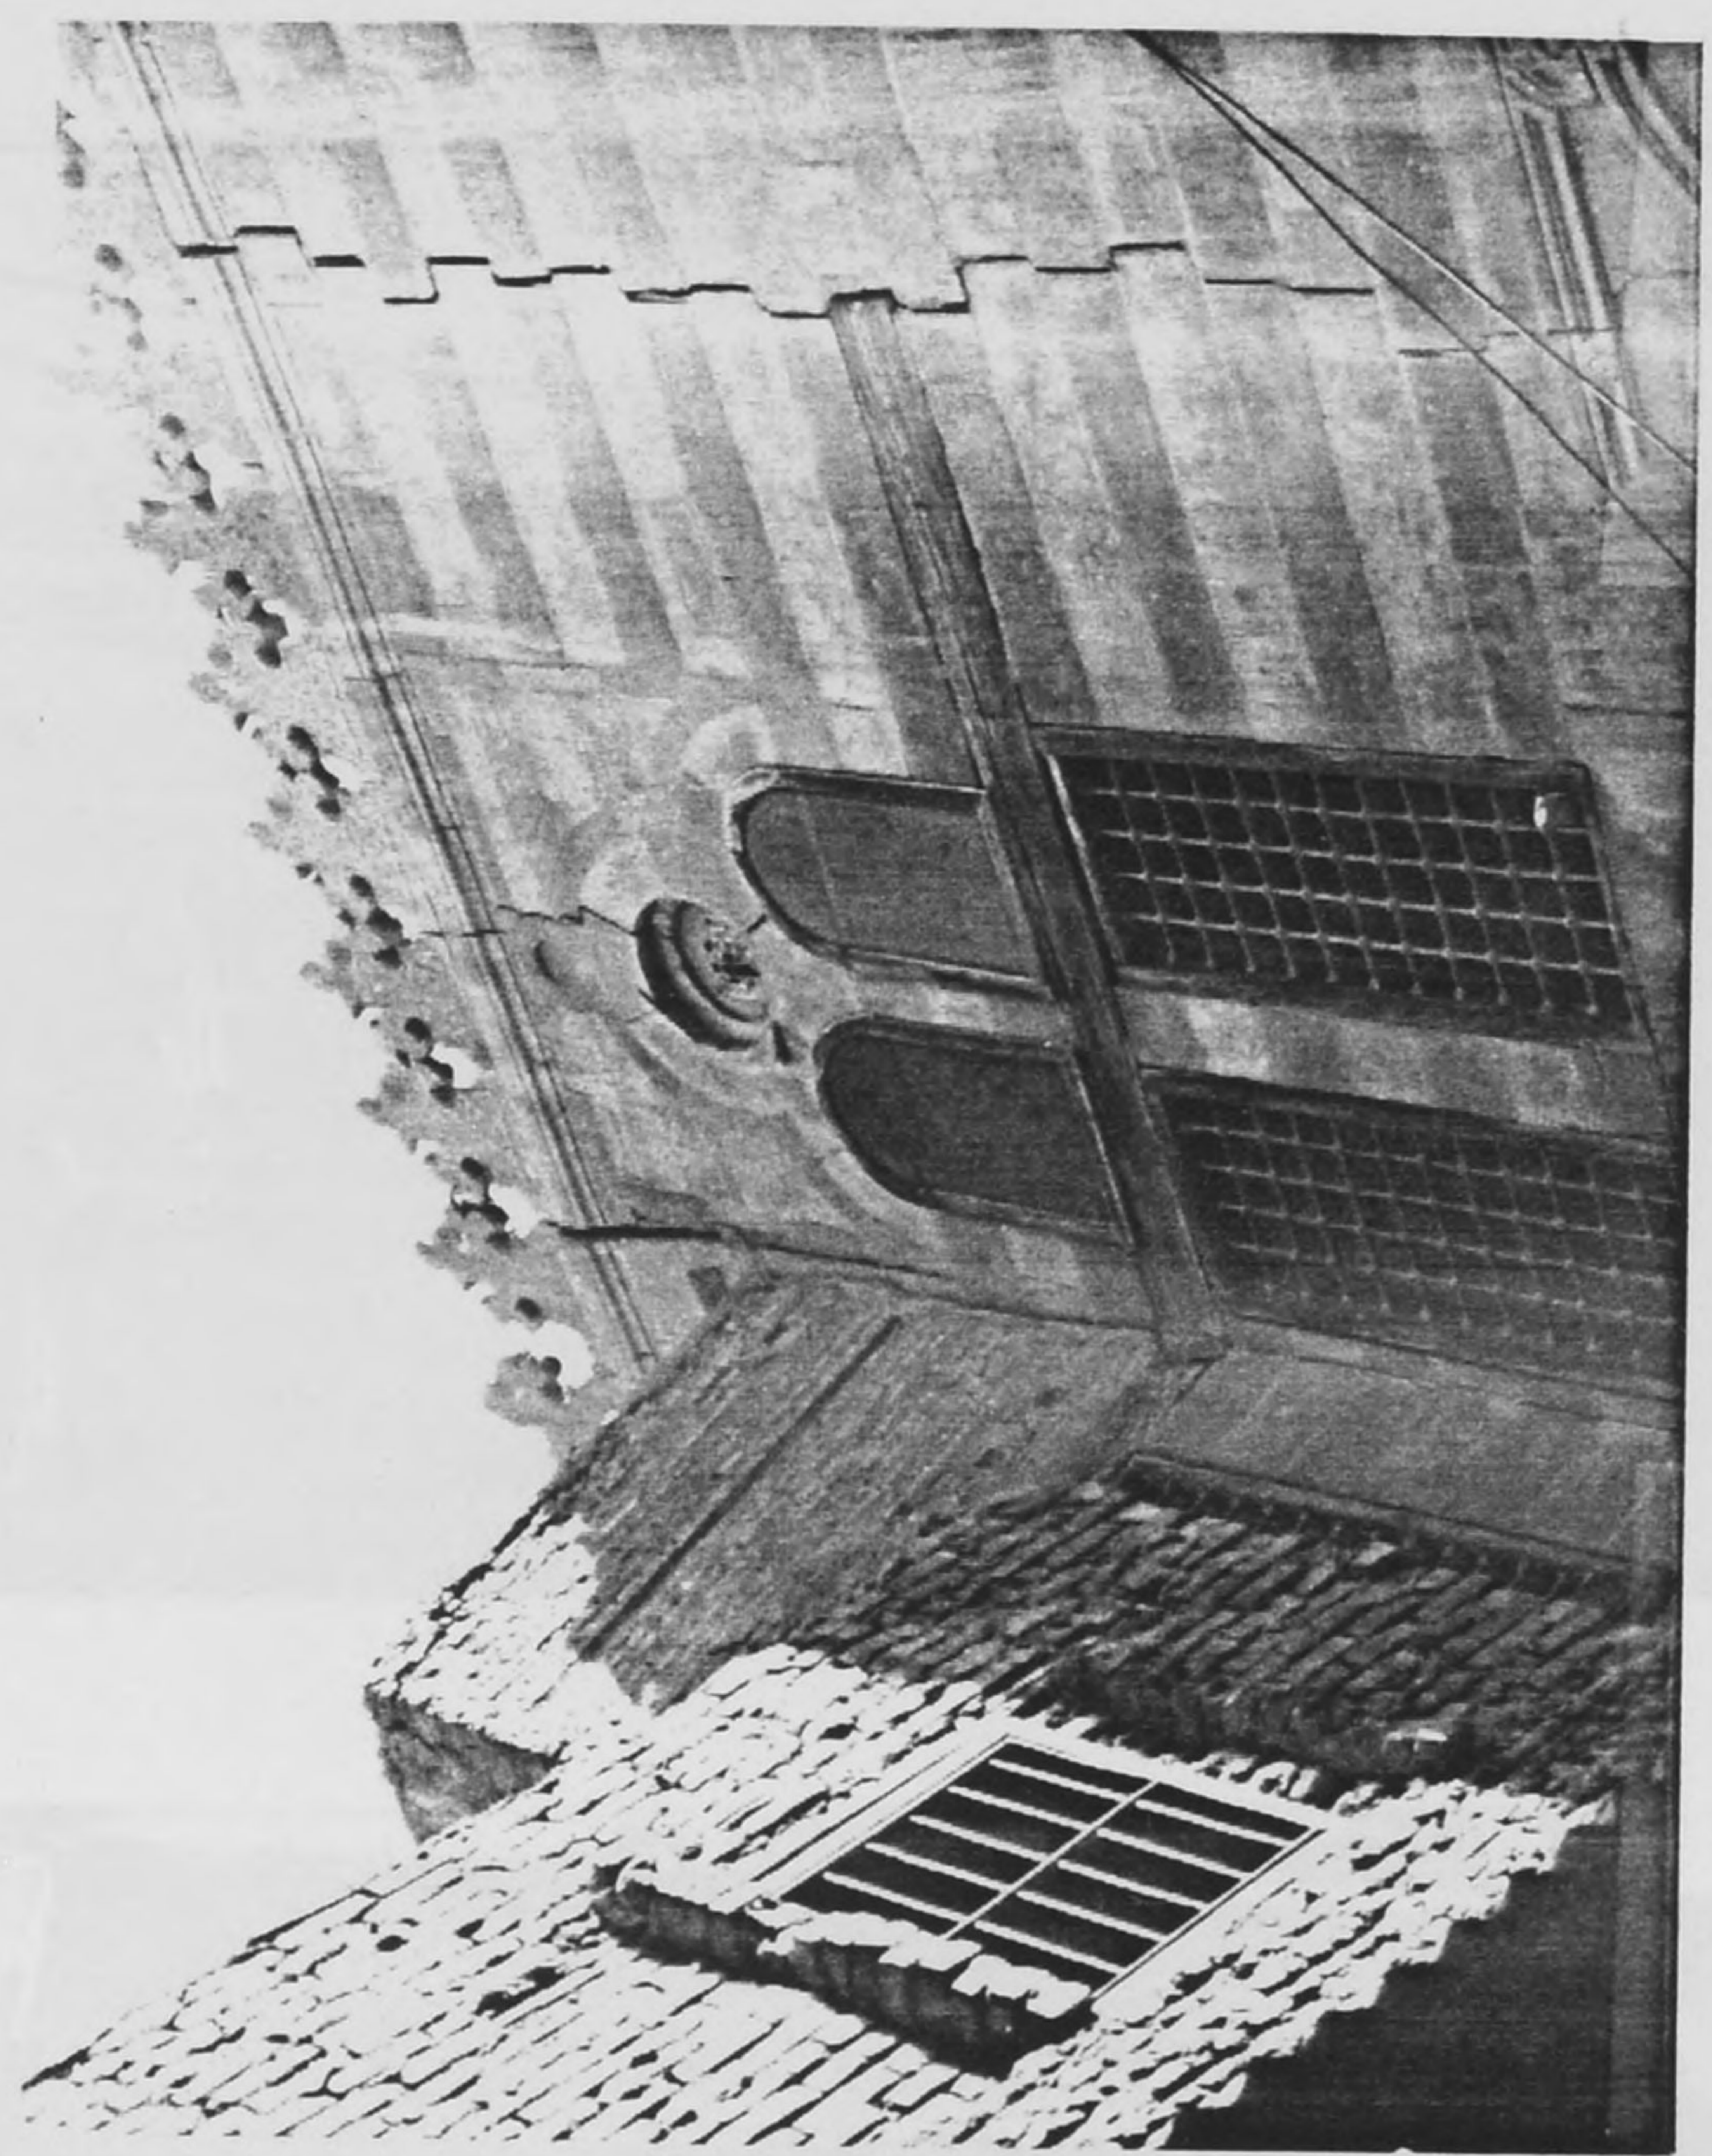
Cracks in west wall of El-Ghuri Mosque
